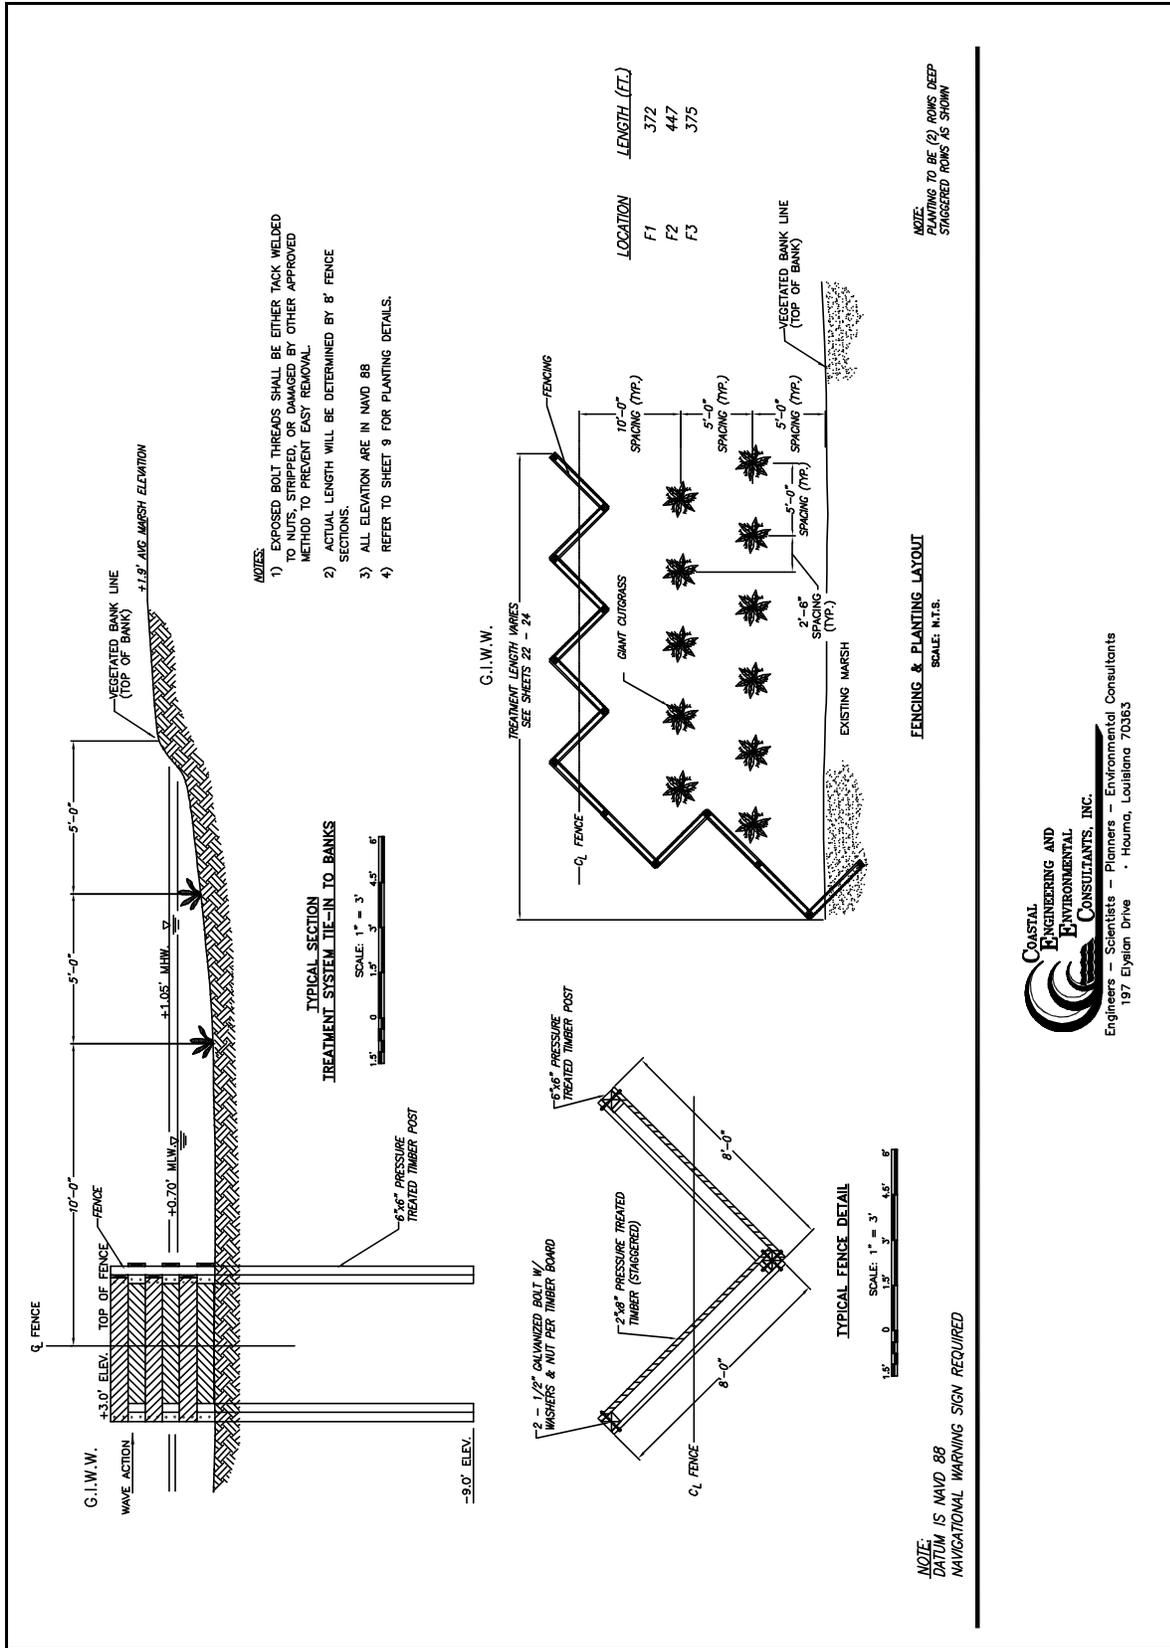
Typical section views of fencing and planting layout (treatment F) for (TE-41) Mandalay Bank Protection (Demo) Project (from CEEC 2001, not to scale).
